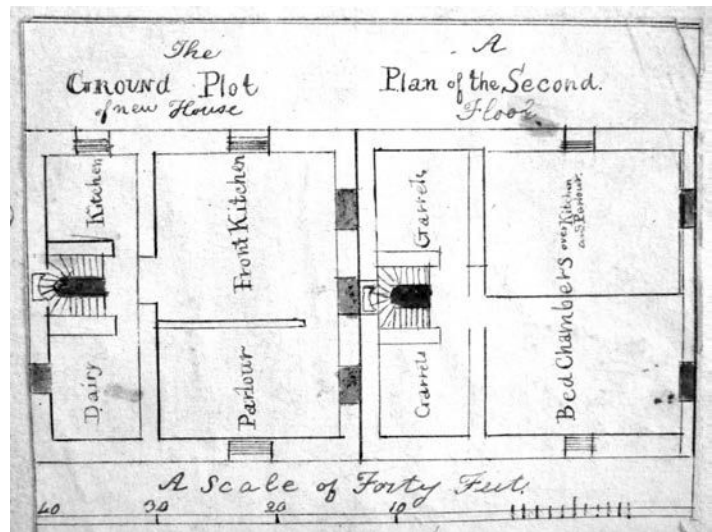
(right): Floor plans, presumed to correspond to the new house of 1801
